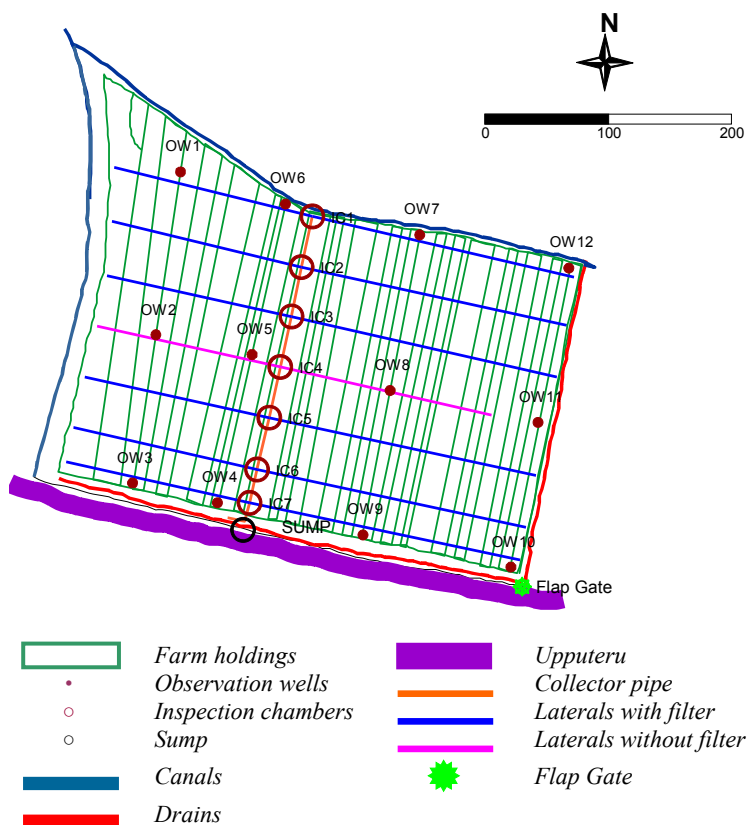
Layout of sub-surface drainage system in Kalipatnam Pilot area
